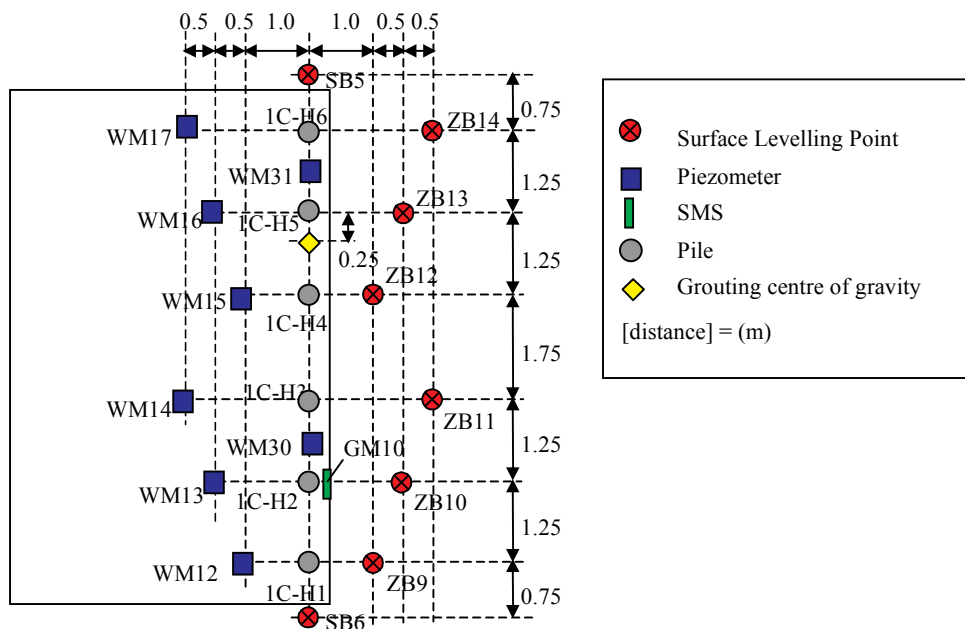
Detailed Test Set-up: Plan View of the Monitoring Equipment
